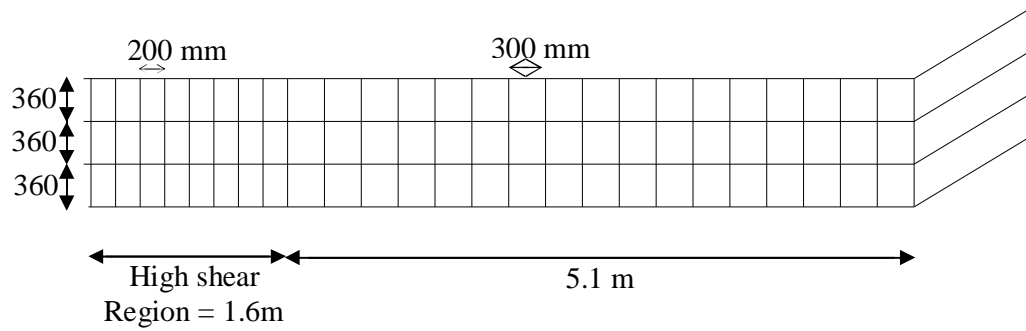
The reinforcement arrangement to the wing wall of the box culvert
